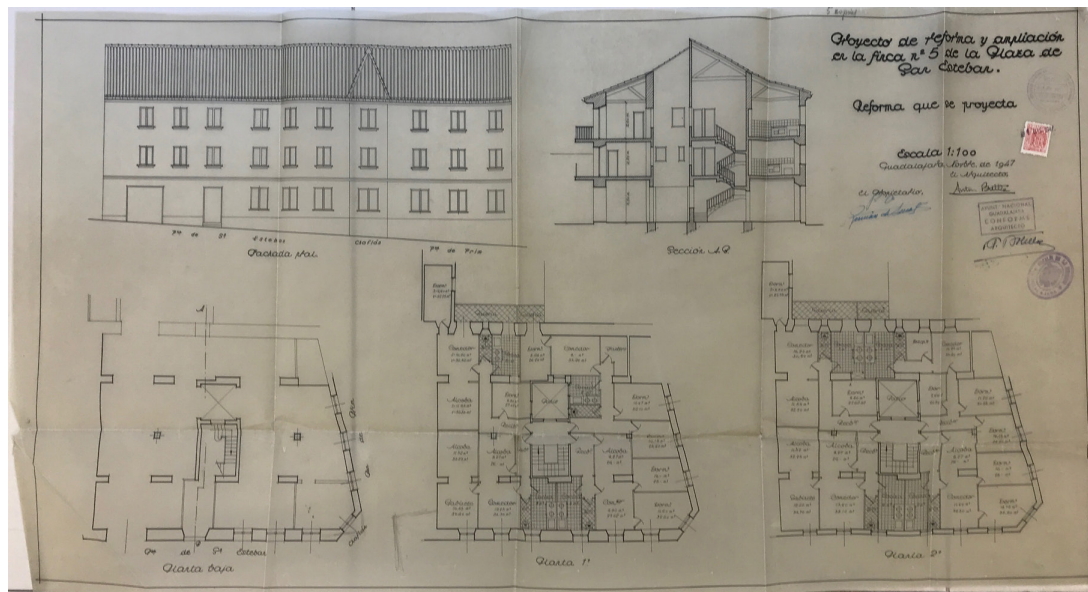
Plan for the refurbishment and expansion of the property at no. 5, Plaza de San Esteban Refurbishment. GMA
